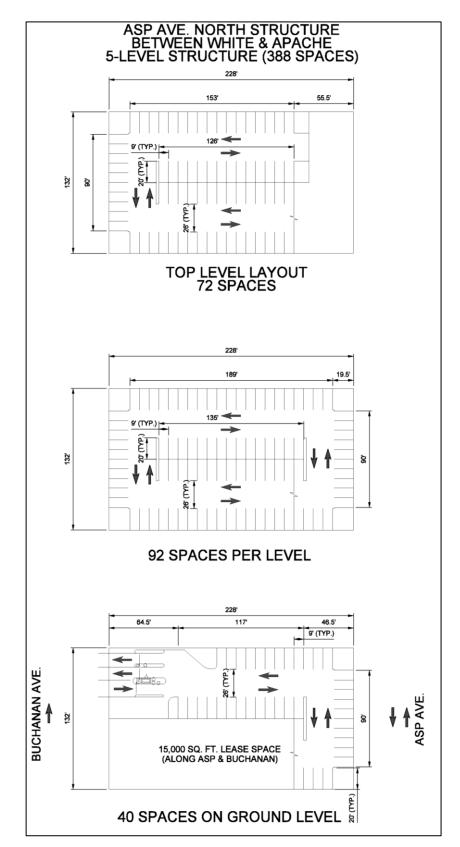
Schematic Structure Layout - CC-02a or CC-02b
